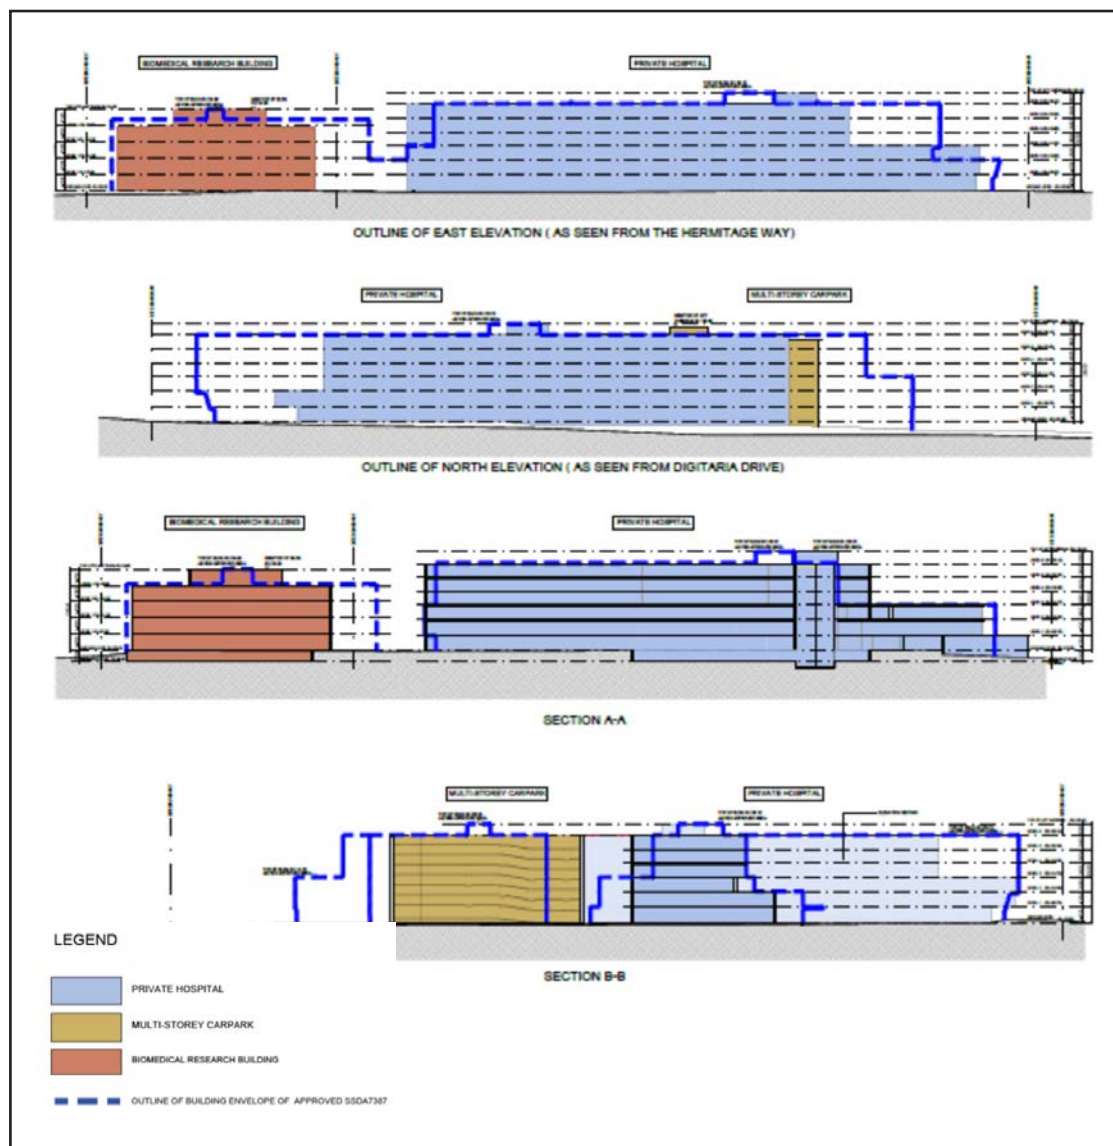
| Building Elevations and Sections (Source: Modification Report)
